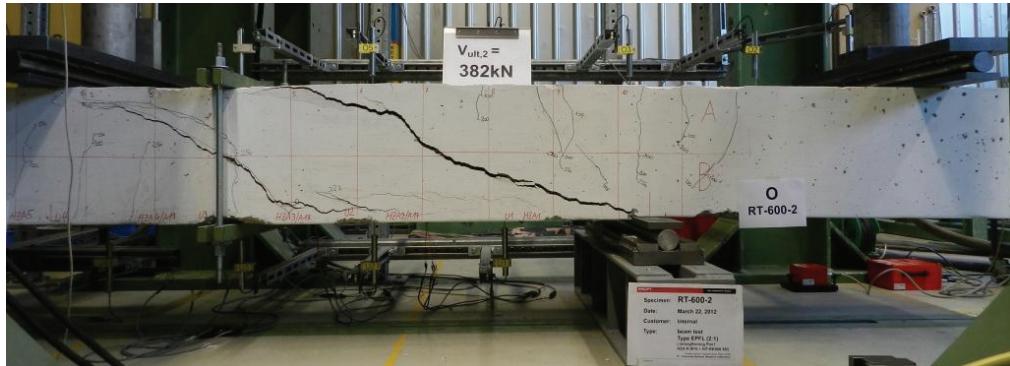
Specimen RT 600-2 at second failure; first crack was braced after full opening
